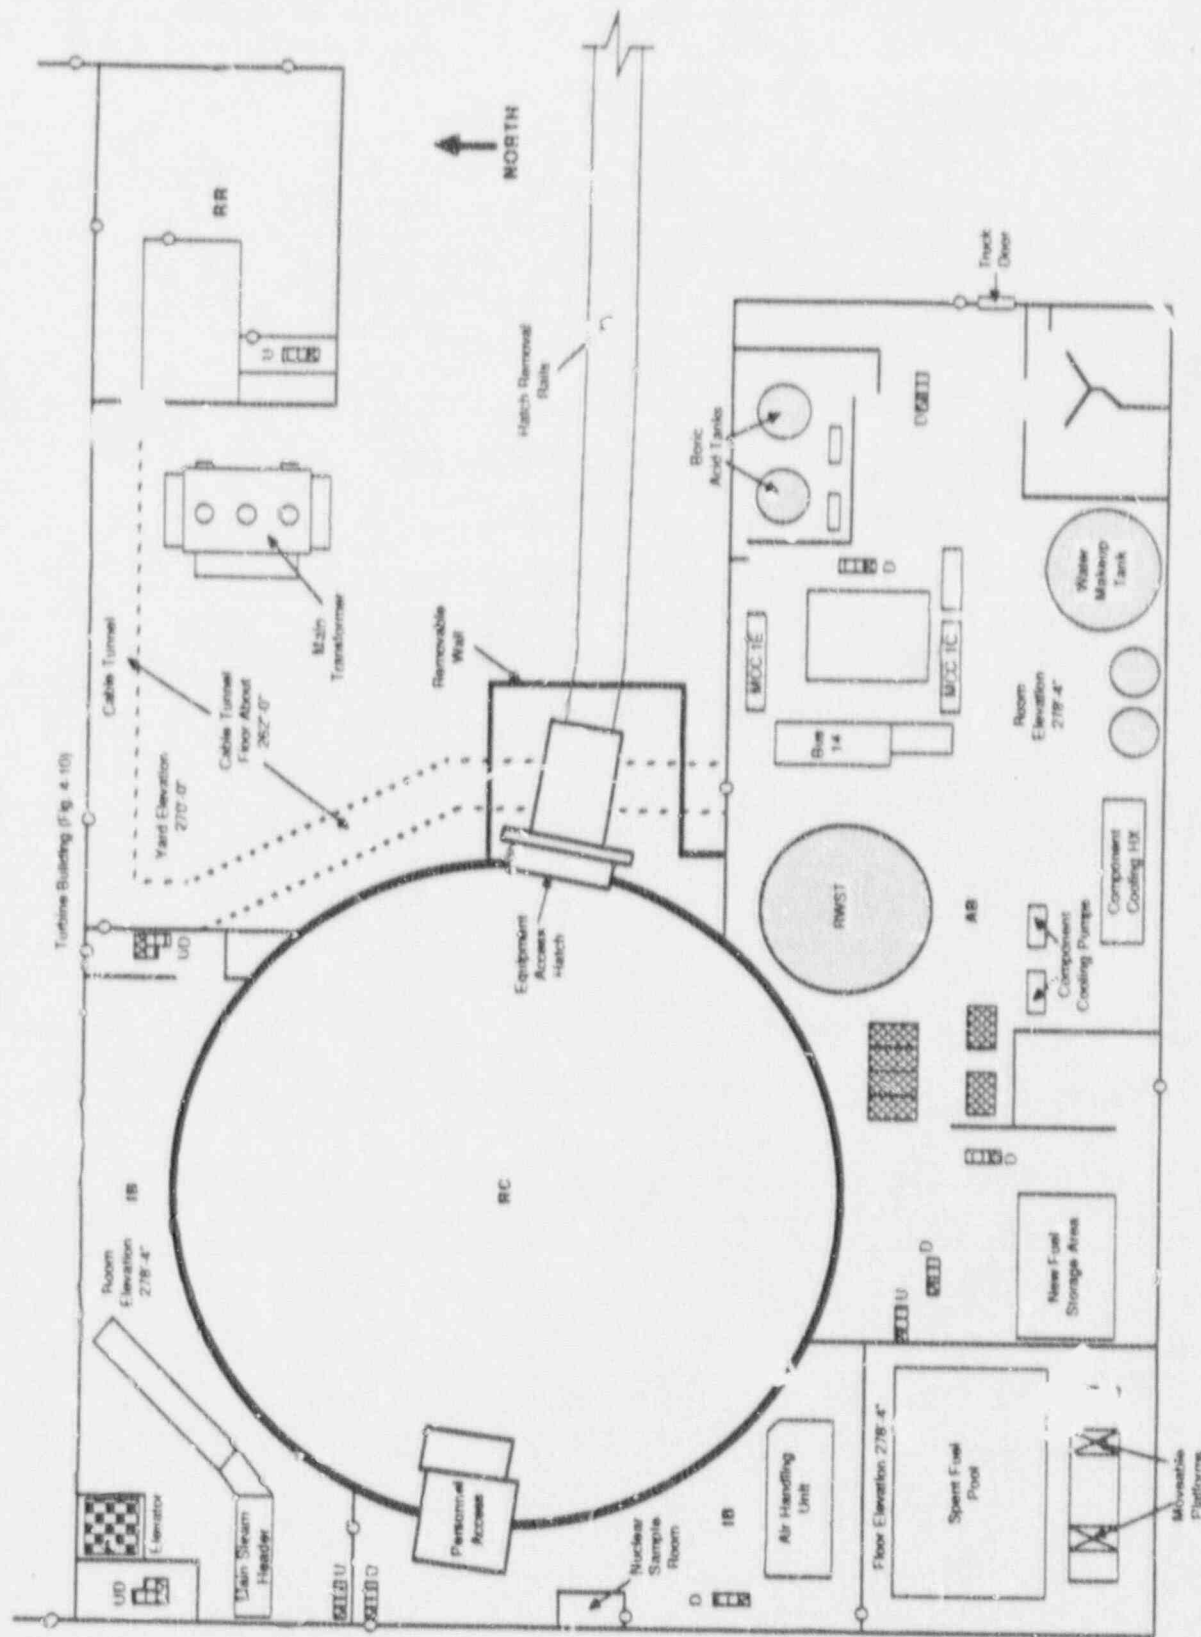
Ginna Reactor Building, Elevation 271'-0"
